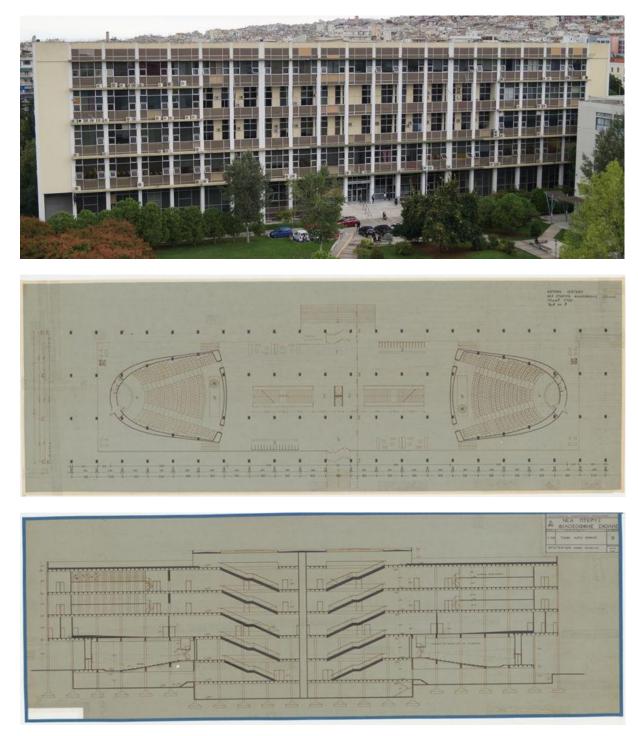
Main façade (a), plan of the ground floor (b) and the longitudinal crosssection (c) of the building of the Philosophical Faculty of AUTH
